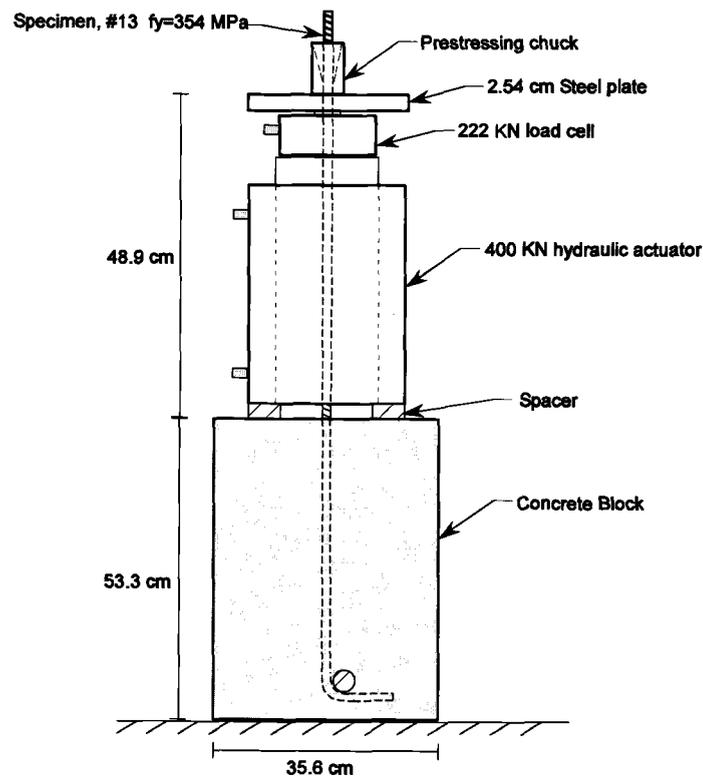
Testing apparatus for in-concrete cyclic loading of reinforcing steel.
